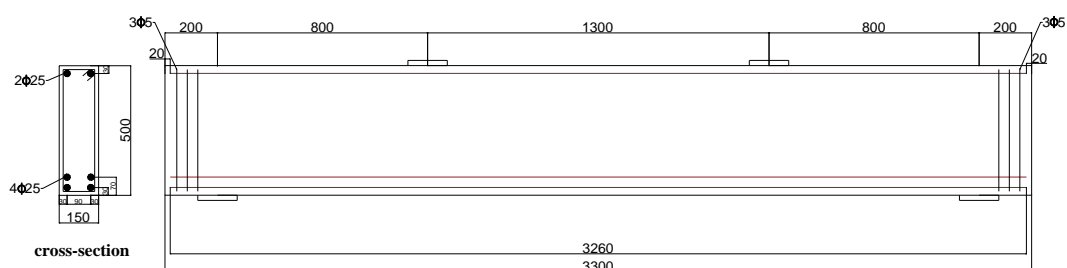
Details of a typical specimen without internal shear reinforcement (dimensions in mm)
